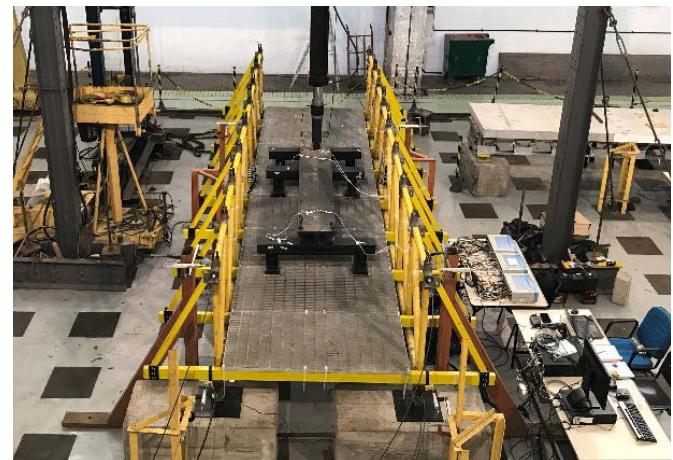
Loading structure positioned on the bridge. Source: Authors' collection.
